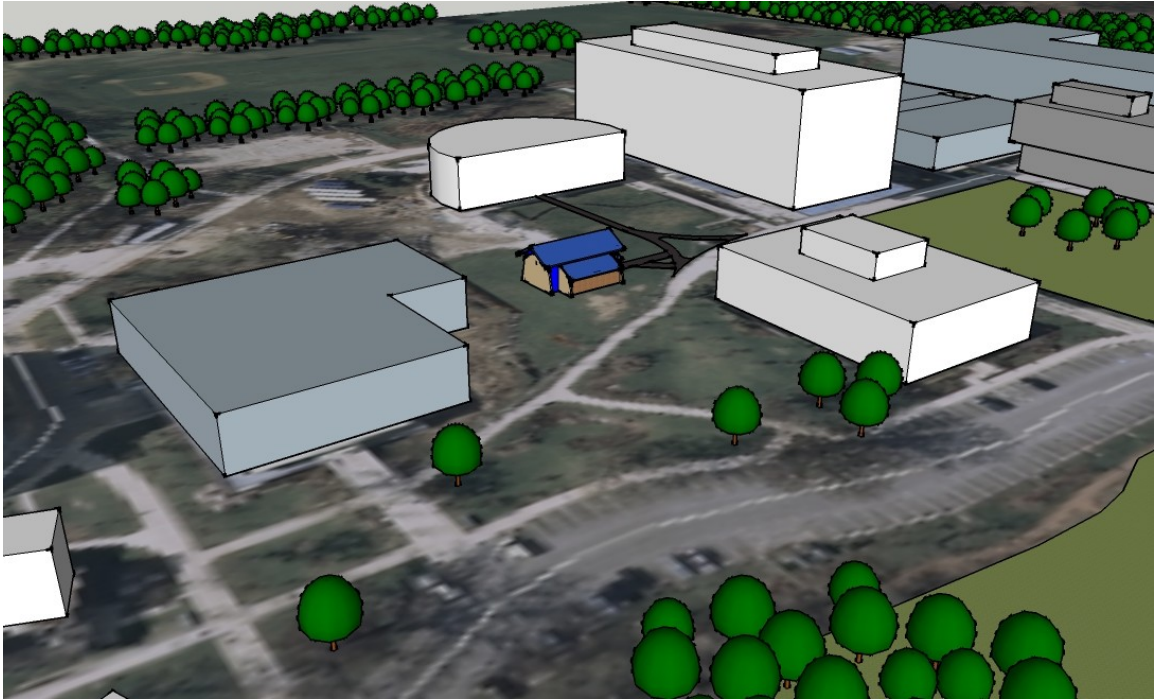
Looking at proposed chapel (blue roof) from the northeast.
